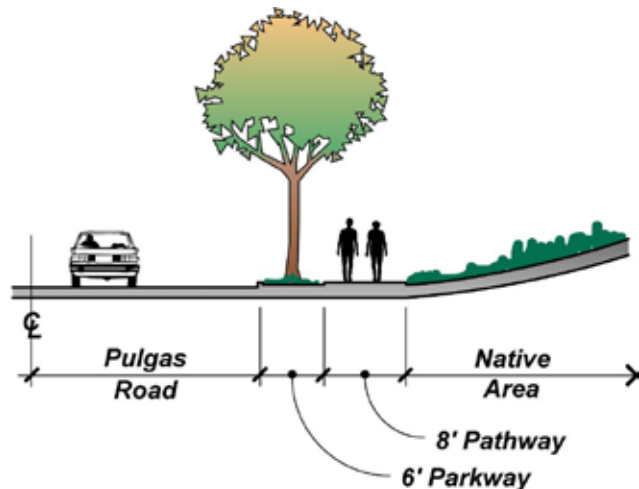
Streetscape planting along Las Pulgas Road.
